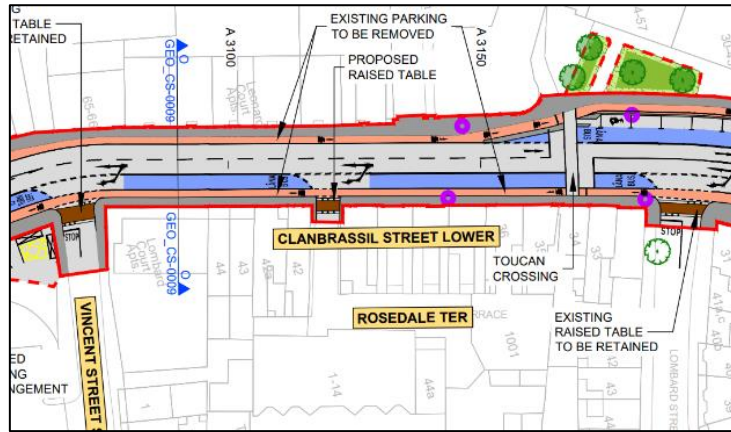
Proposed Scheme Layout at Clanbrassil Street Lower (Sheet 09)
